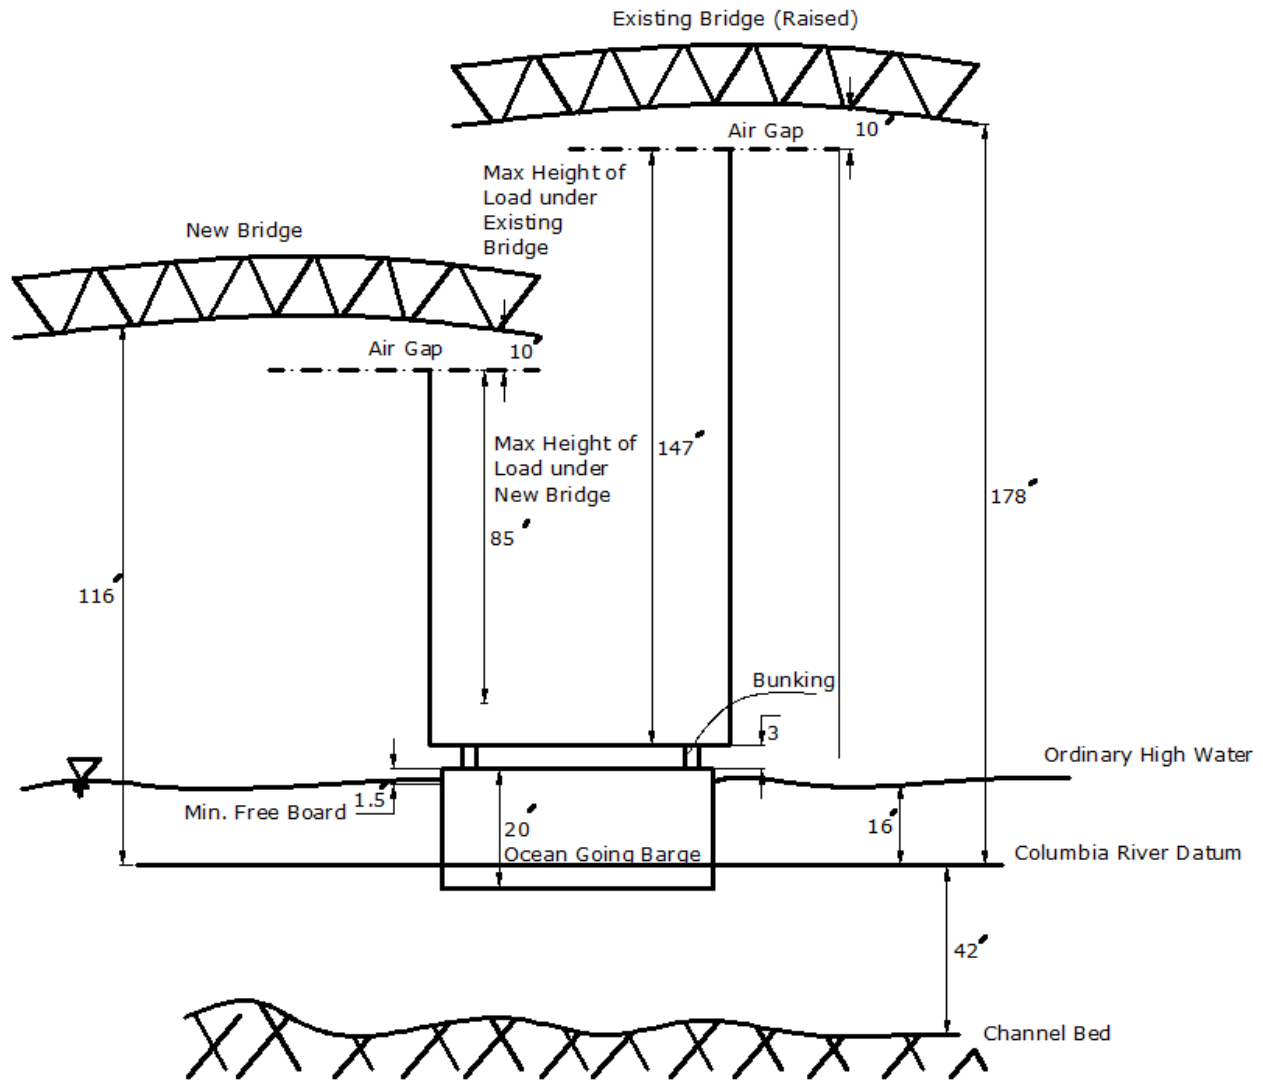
Maximum height of load on an ocean-going barge underneath the existing and new Columbia River Bridge
